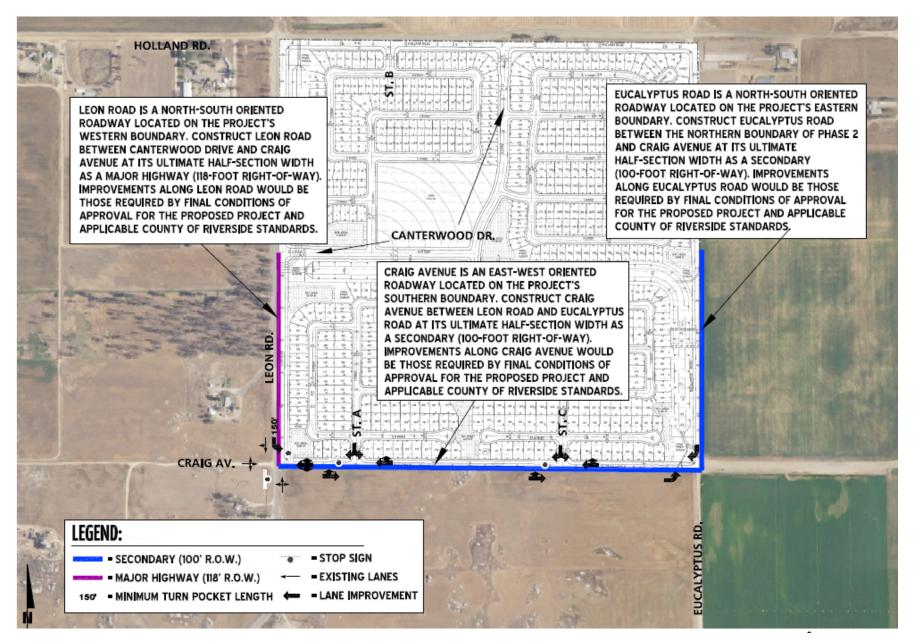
PHASE 2 PROJECT BUILDOUT (2025) SITE ADJACENT ROADWAY AND SITE ACCESS IMPROVEMENTS
